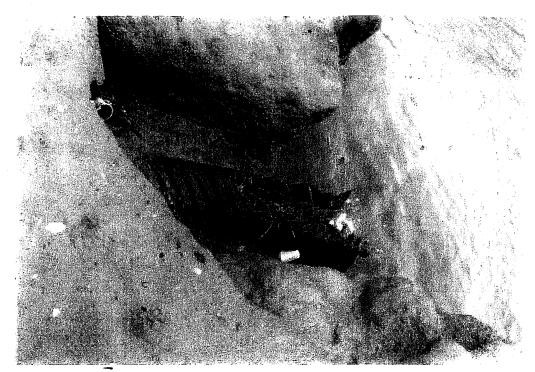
Conduit between channel and wetlands where replacement is proposed.
